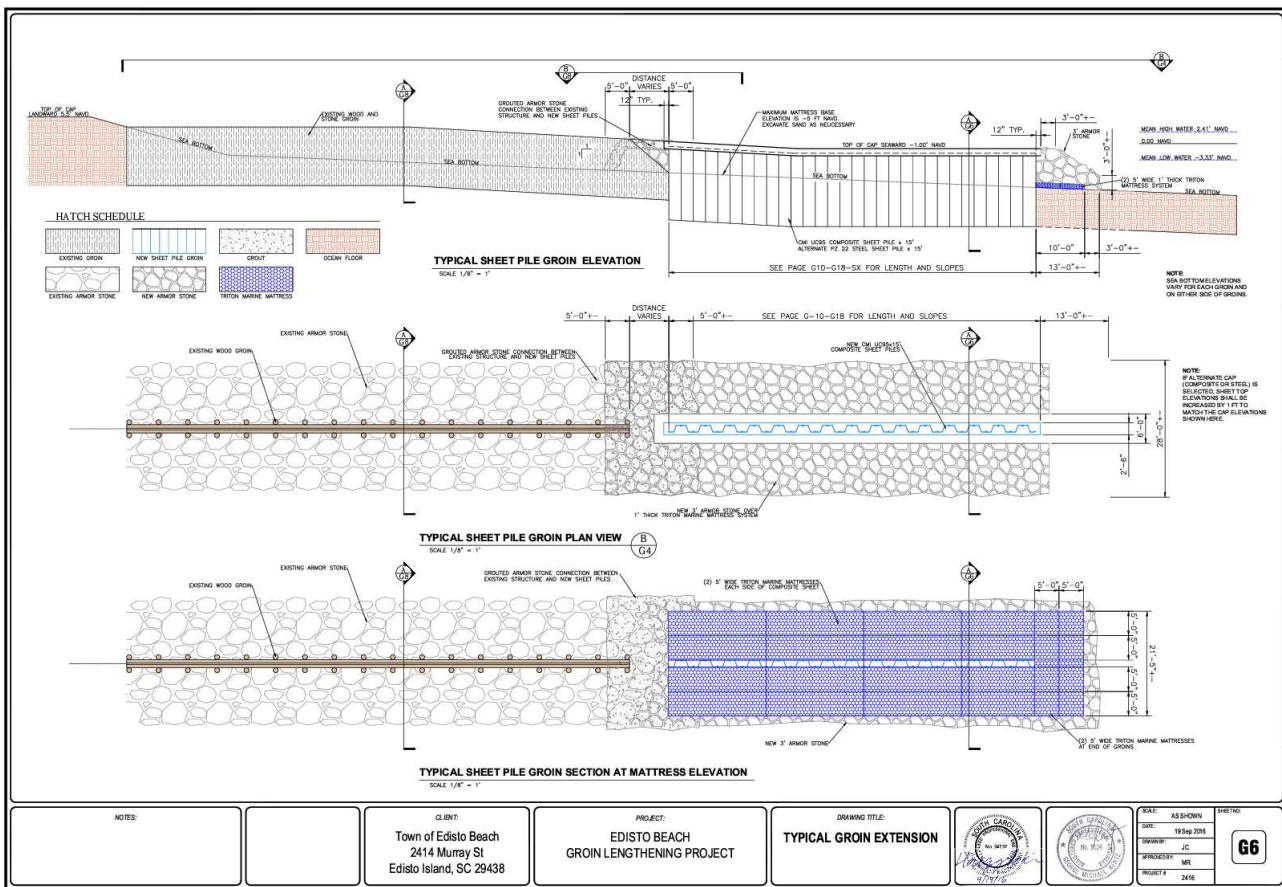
Groin extension design including marine mattress, armor stone scour protection, and fiberglass/vinyl composite sheet piles.
